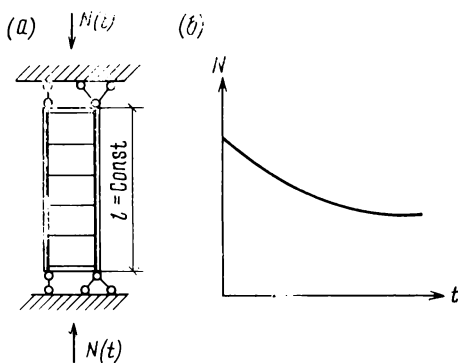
Stress relaxation in concrete with the stress in the steel of a prism held constant
